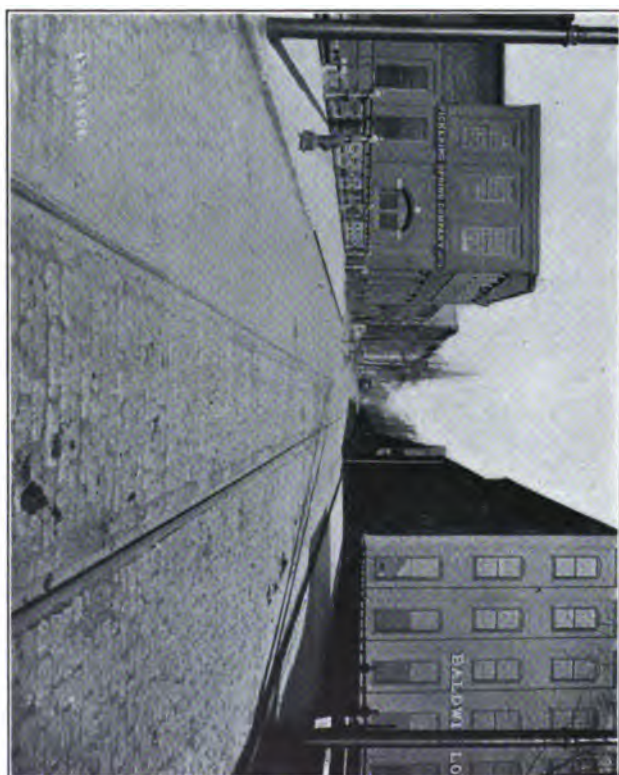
EIGHTEENTH STREET BRIDGE.
